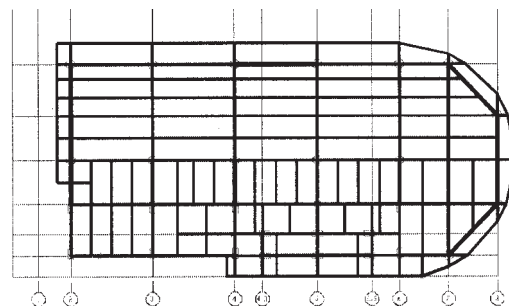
(b). Floor plan for building (courtesy of Professor Dan Dubina).
